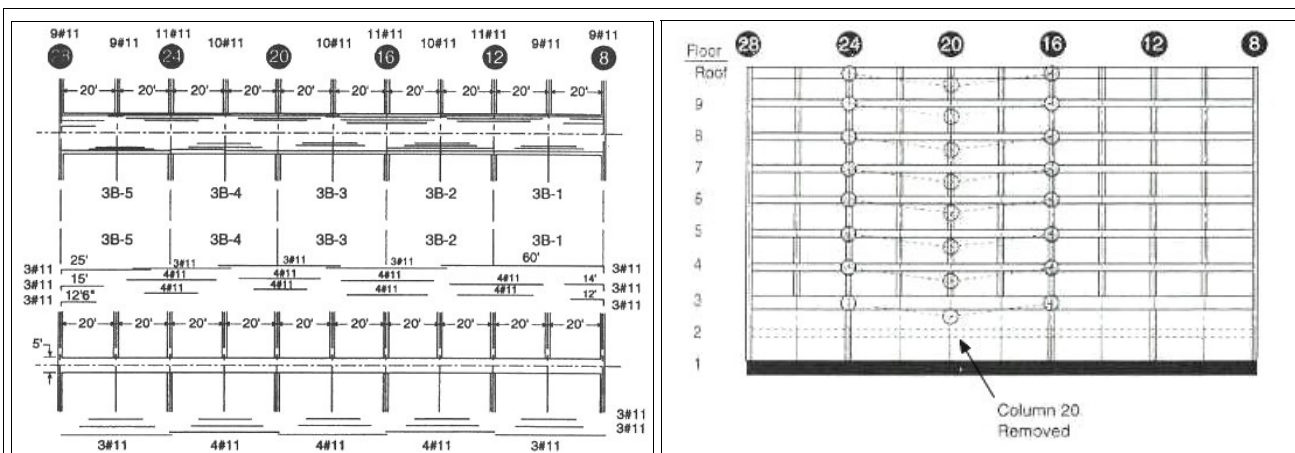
A.P. Murrah Building. (Left) Longitudinal reinforcement on the third floor transfer girder. It is to be noticed the absolute lack of continuity of the lower bars. (Right) Collapse mechanism of the north facade in case of removal of column G20 alone. (Source: [45]).
